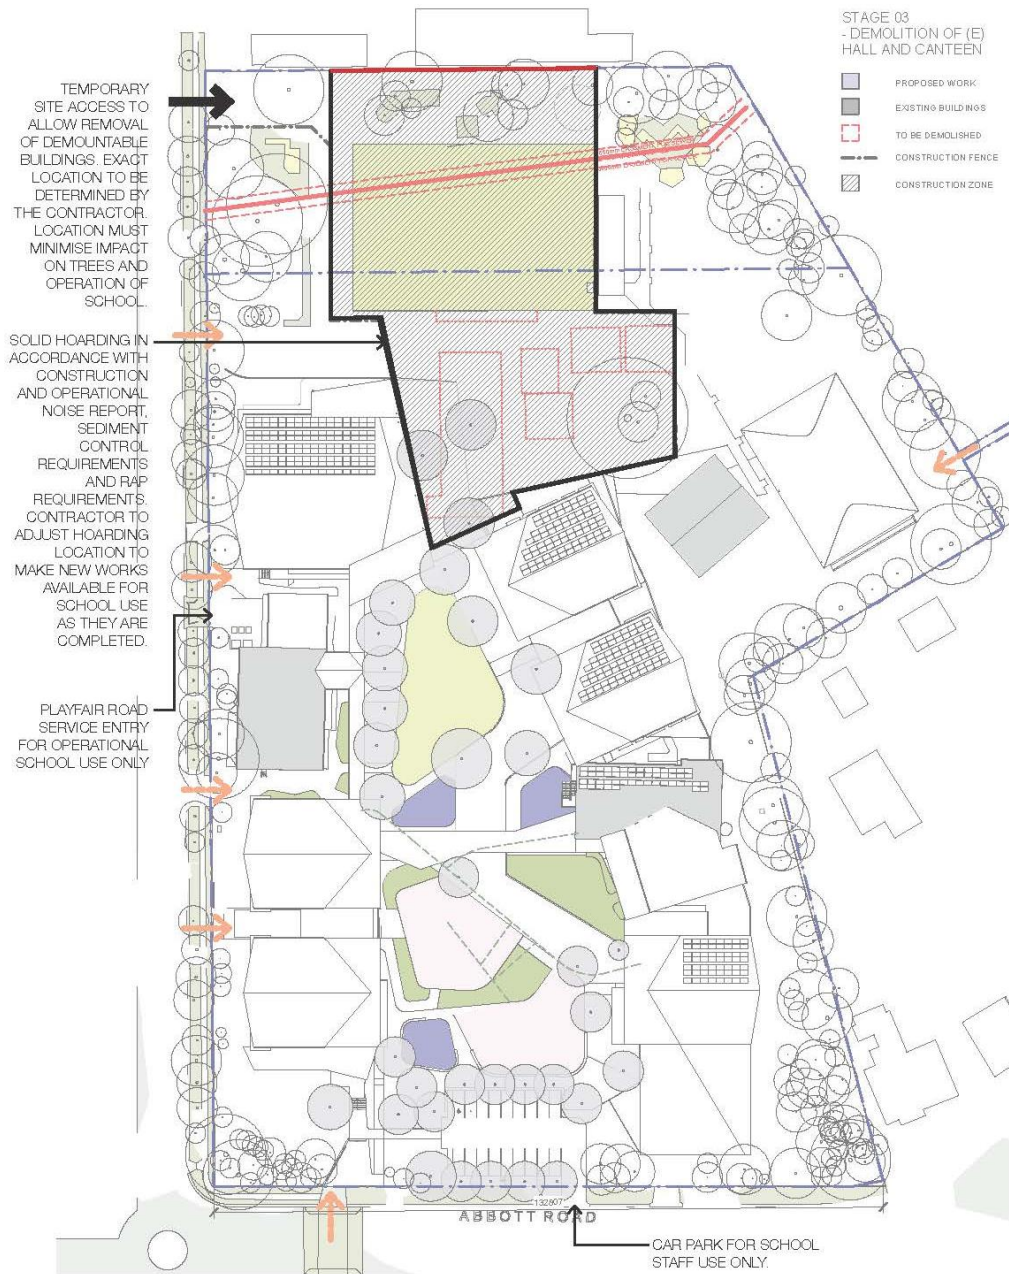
Stage 3 Construction Site Diagram. CONCEPT ONLY - Contractor to prepare final plan
